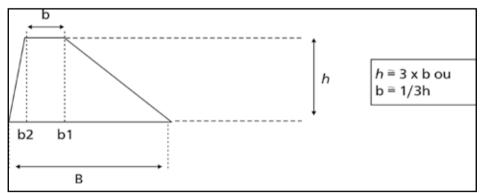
Schematic Drawing of Crest Width of a Stone Dam Source: Padilha (1997).
